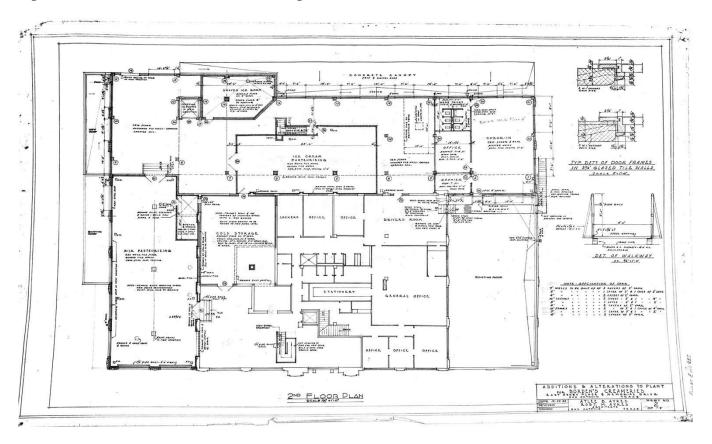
Historic Plans Showing 1946 Additions, December 22, 1945.
